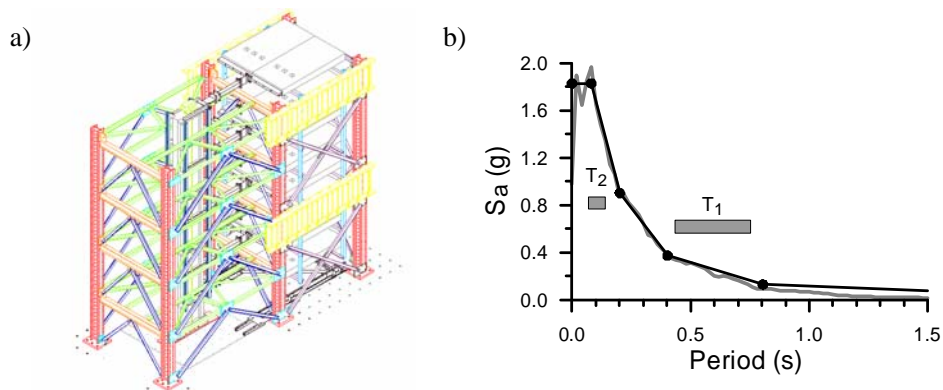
a) Proposed test setup; b) Design and earthquake design spectra.
